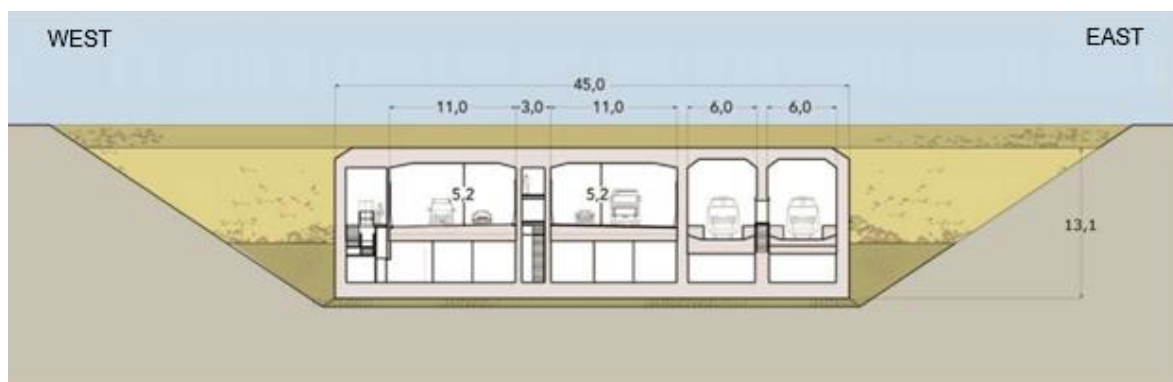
Cross section immersed tunnel - special element (dimensions in m)
